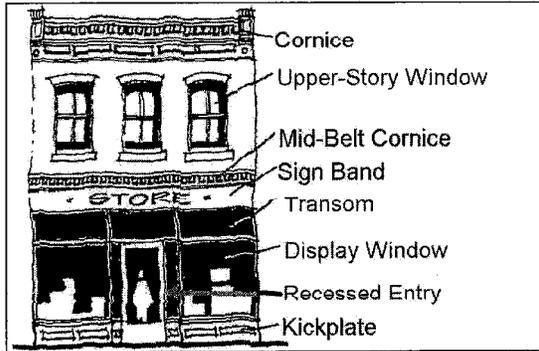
Some of the key features of a historic commercial building typically found in downtown.
